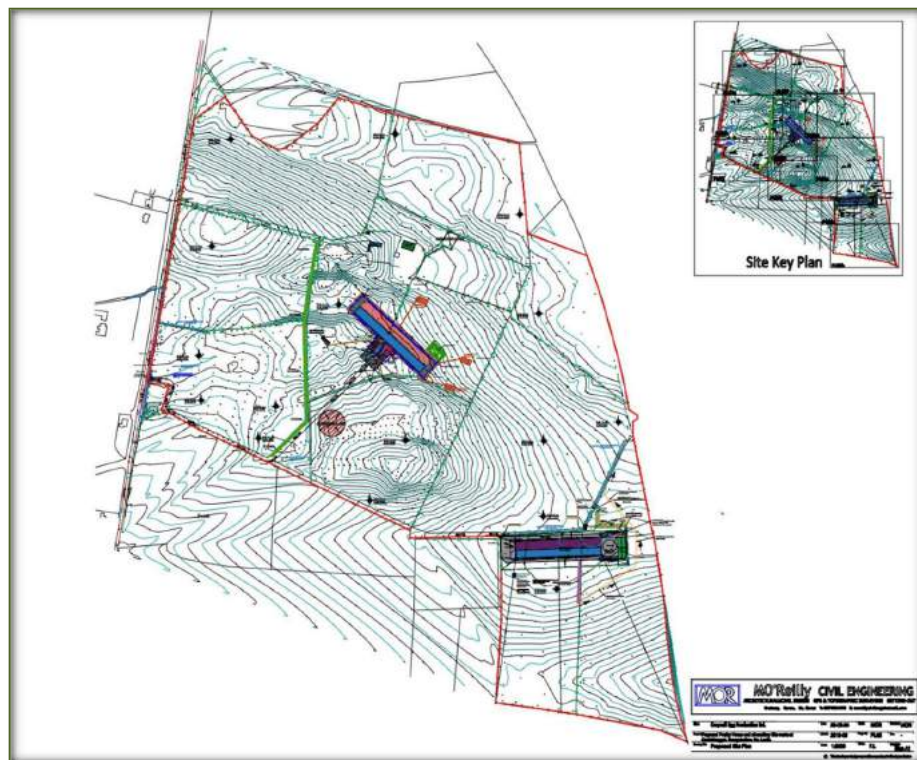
Proposed Site Plan (as prepared by M O'Reilly Civil Engineering)
